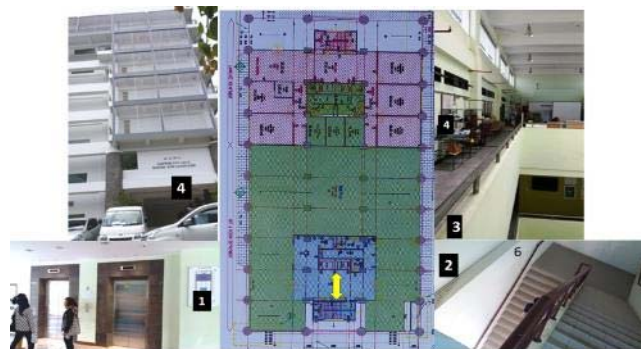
Access vertical - access between rooms 1st floor to 7th floor. Denah 1st floor CADL-ITB
